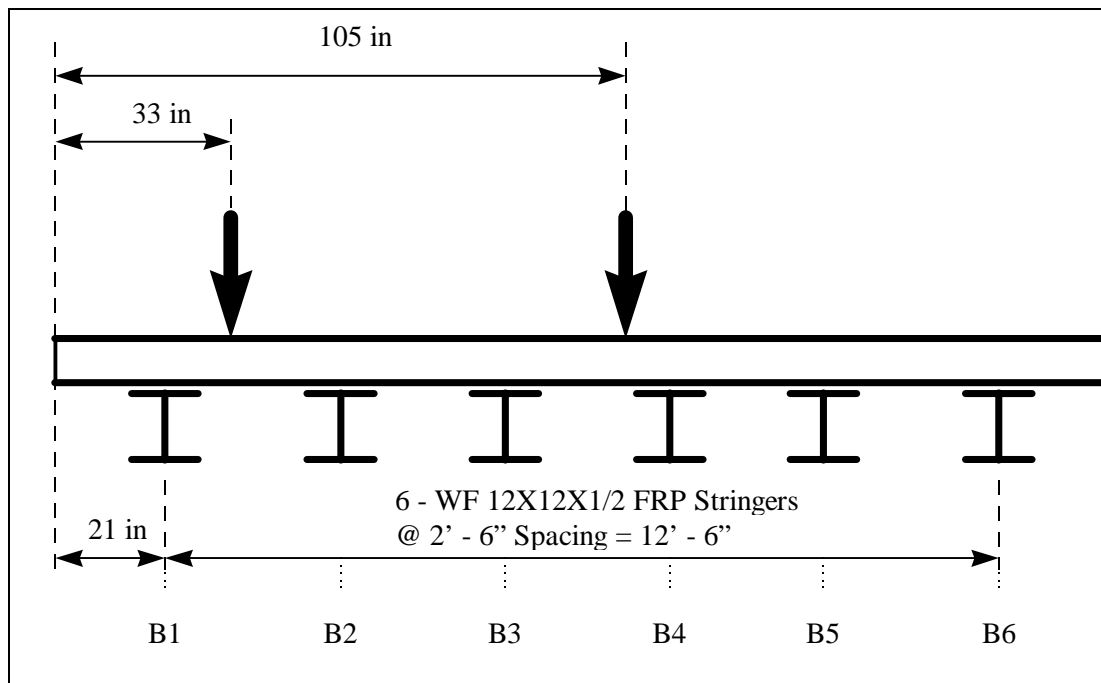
Laurel Lick Bridge cross-section and location of wheel loads.
